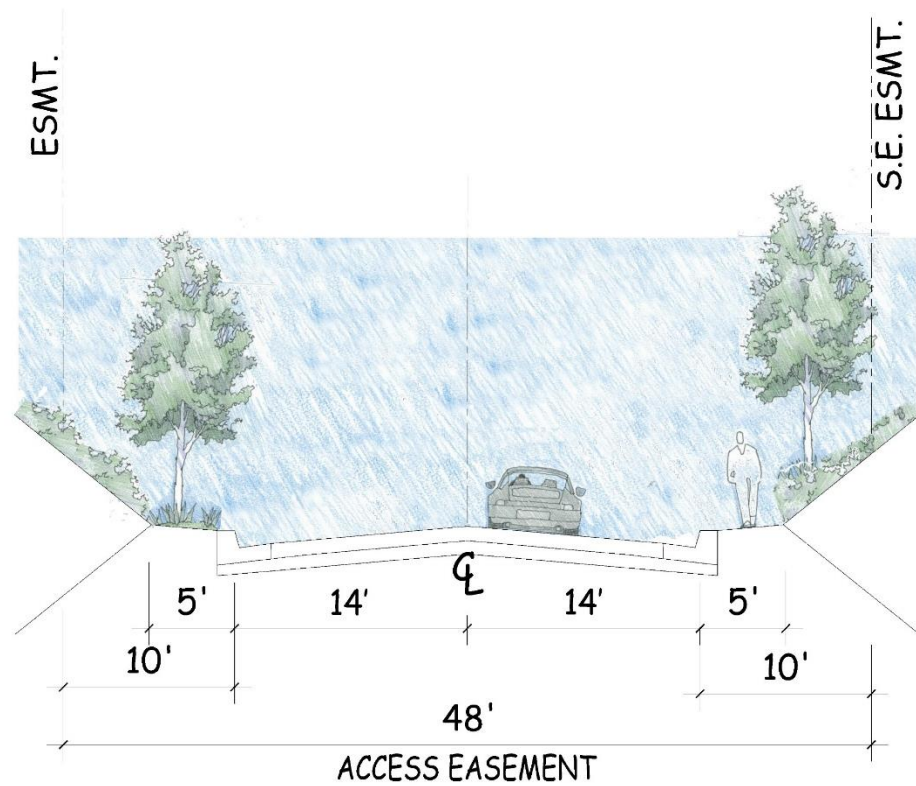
Private Rural Residential Road (Section I 3)
